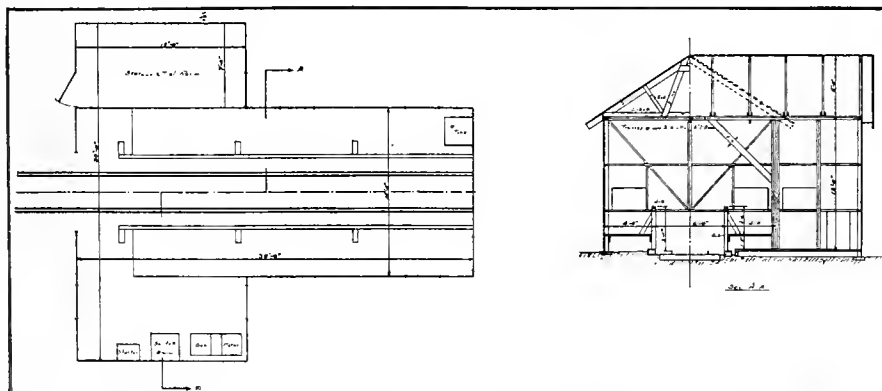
Plan and section of battery-charging station on Pit 3 project.
